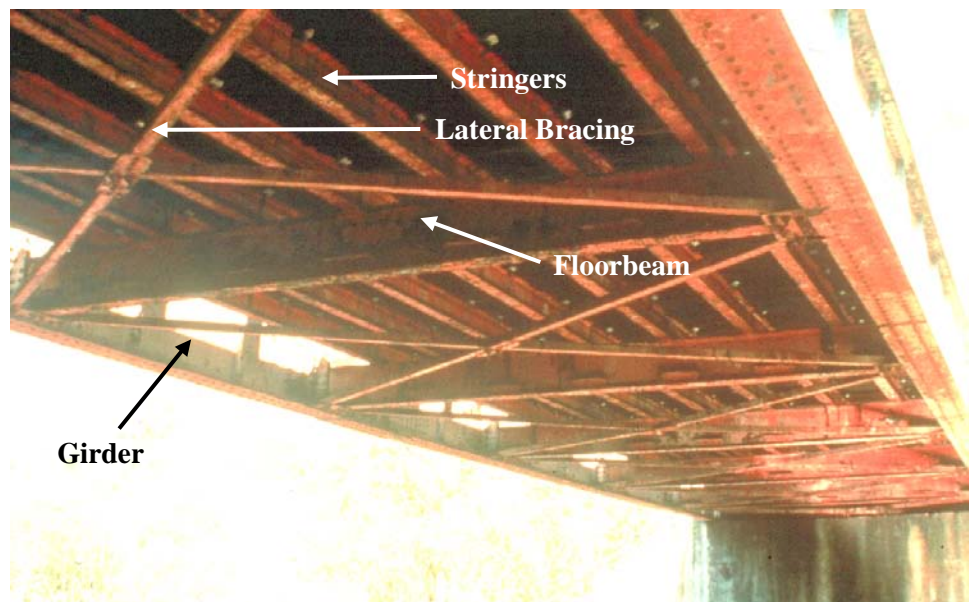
Underside View of Through Girder Bridge with Lateral Bracing
